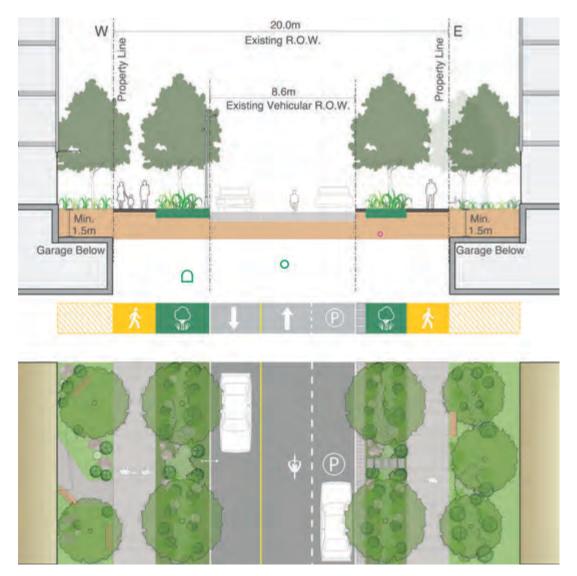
Section and Plan of Pailton Crescent Connector - Recommended Final Condition
